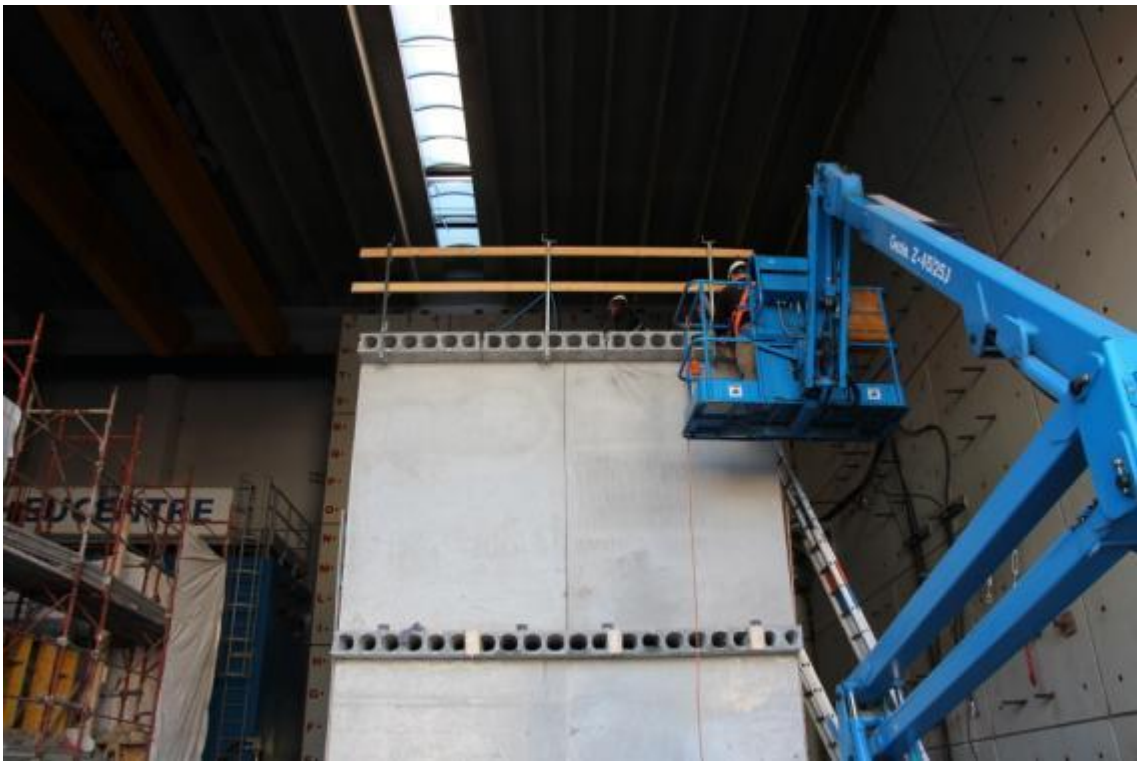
Installation of safety barriers and plywood plates for slab finishing.
